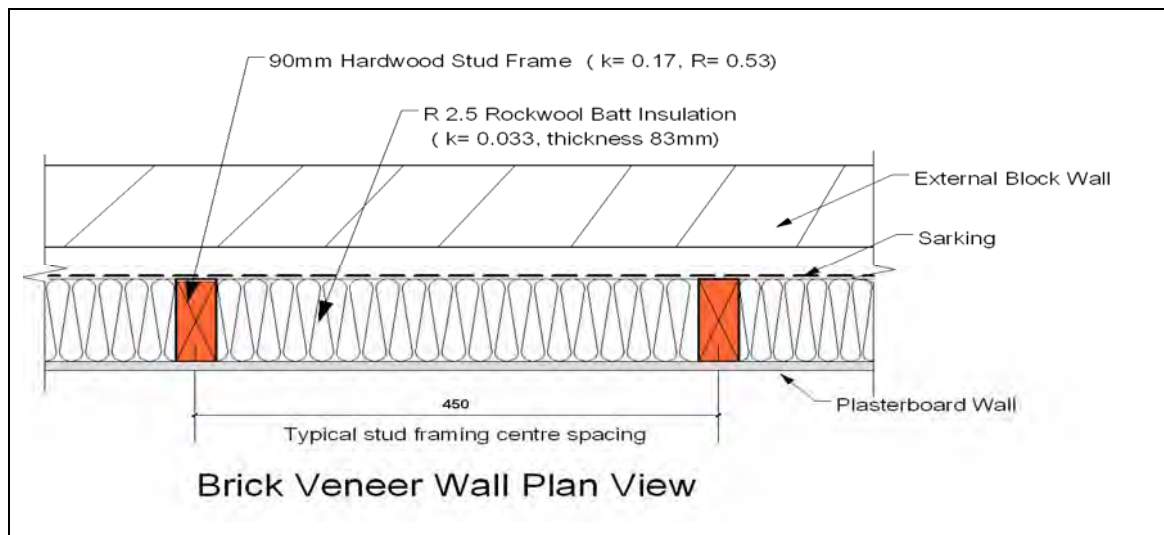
Typical brick veneer wall with 90mm stud framing spaced at 450mm centres
